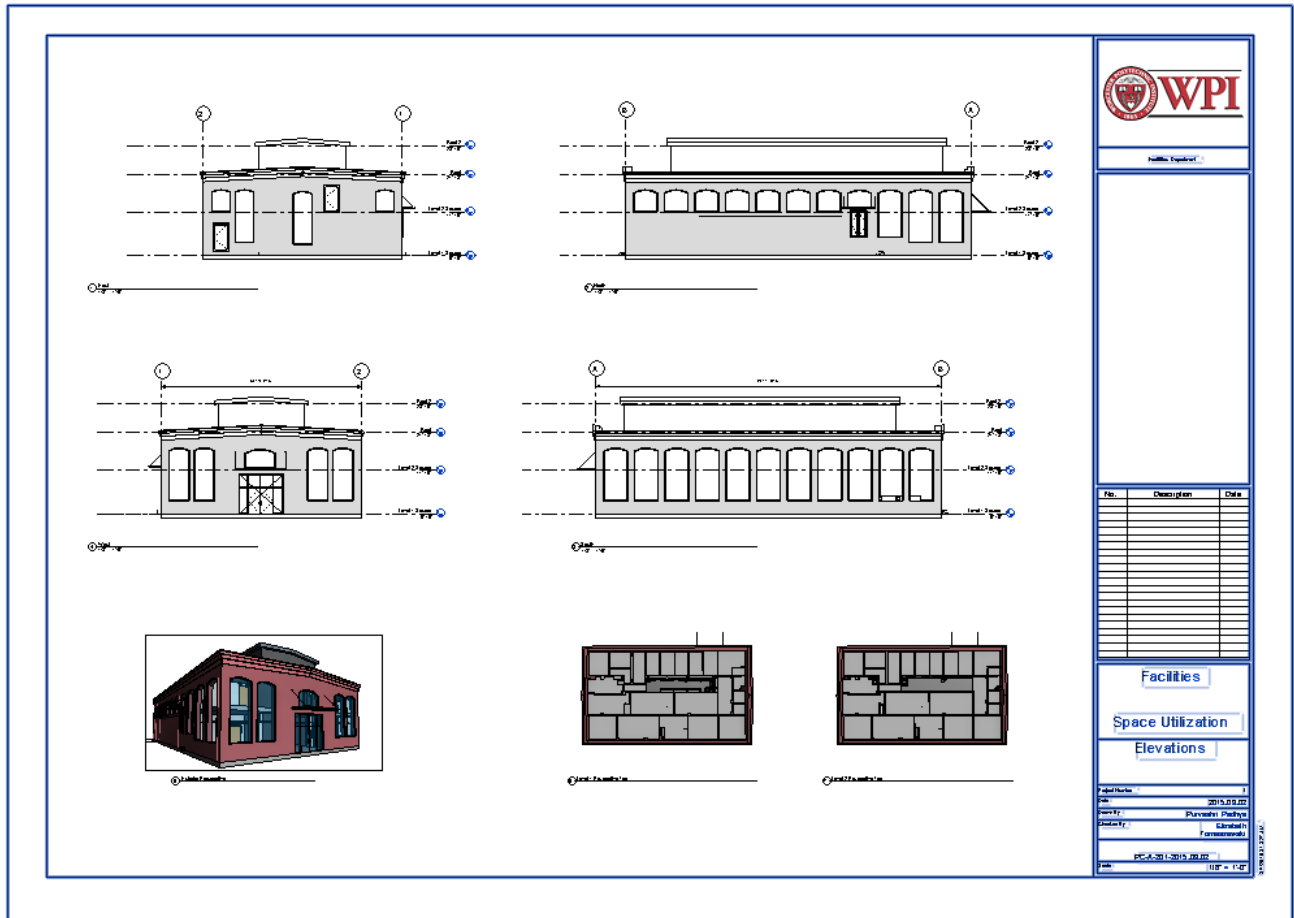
Project Center: Drawing sheet indicating Architectural detailing
